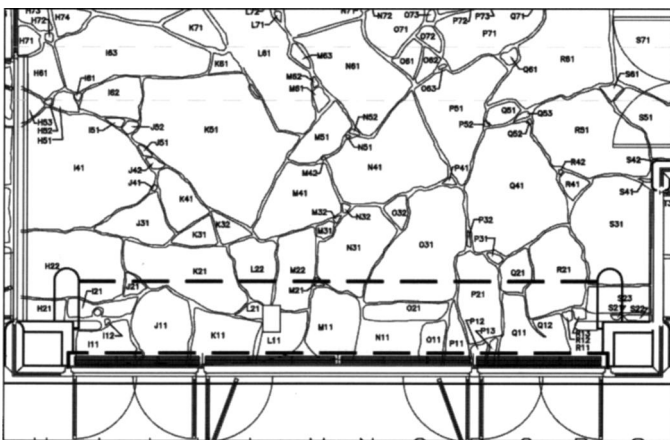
Stone-by-stone drawings were traced by hand from photo mosaics. The tracings were digitized and then inserted to scale with a grid into the construction drawings. These provided a guide for reinstallation of each flagstone floor or terrace scheduled to be lifted. This detail from a drawing depicts the south end of the living room.
